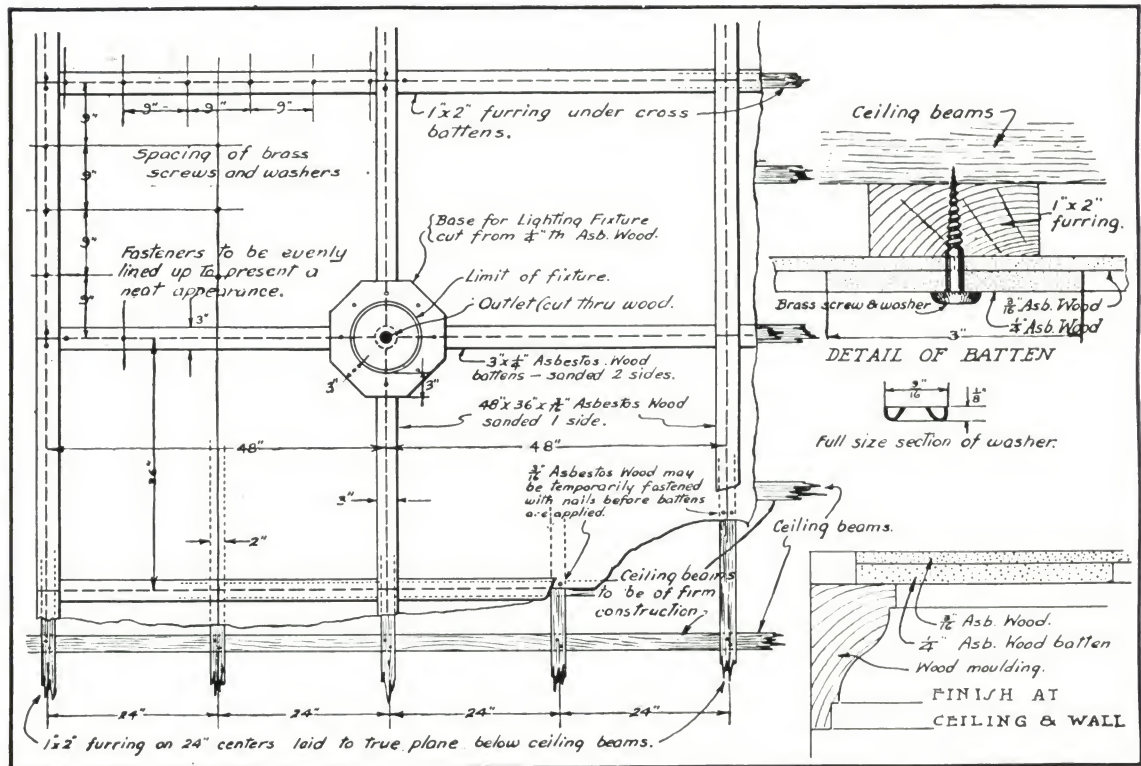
Application of Standard Transite Asbestos Wood as a paneling for ceilings.
